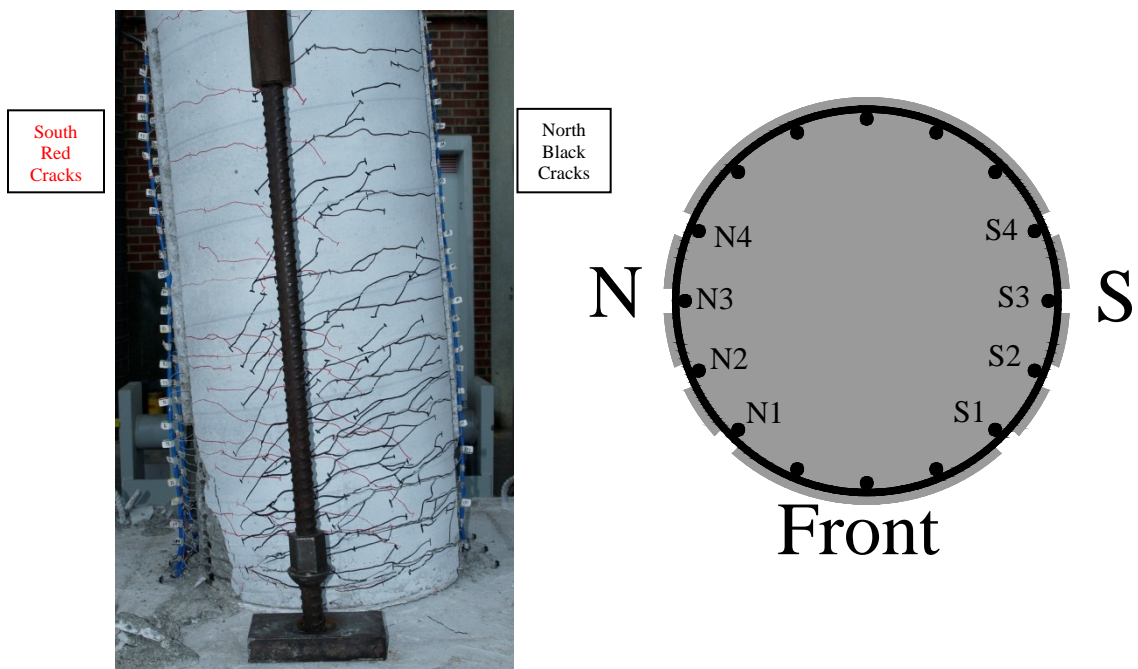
Cross Section Bar Designations – North Reinforcement is Placed into Tension during Push Cycles while South Reinforcement is placed into Tension during Pull Cycles (Photo Taken from the Back Side of the Specimen)
